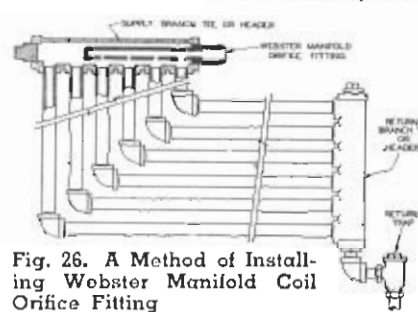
A Method of Installing Webster Manifold Coil Orifice Fitting
